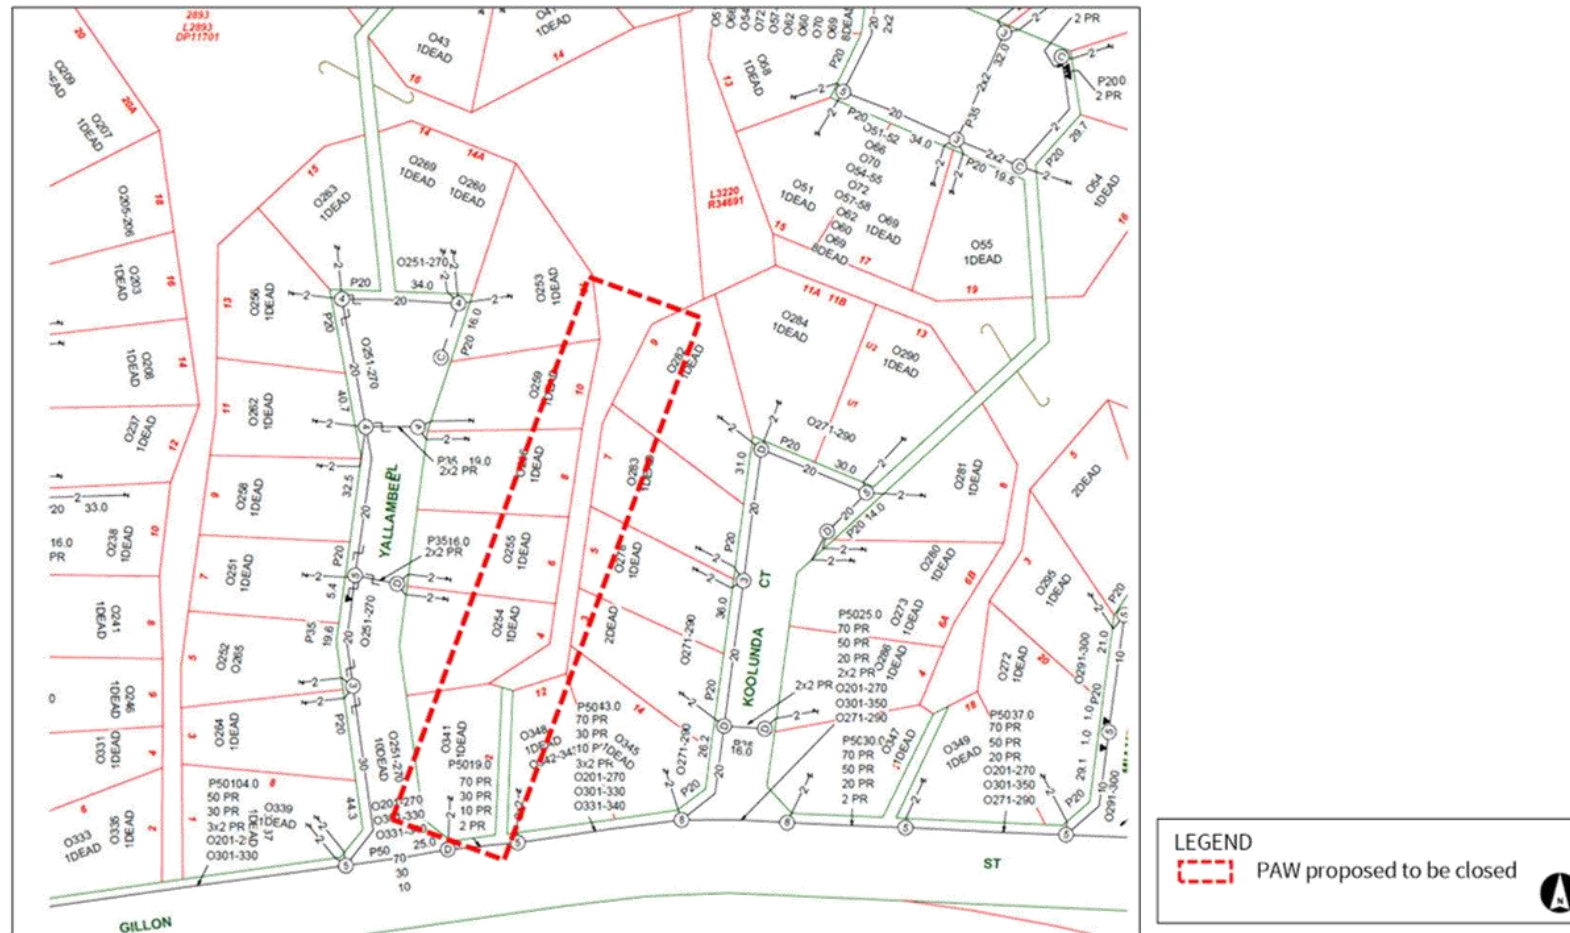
Telstra Cable Plan (issued 5/03/2021)
